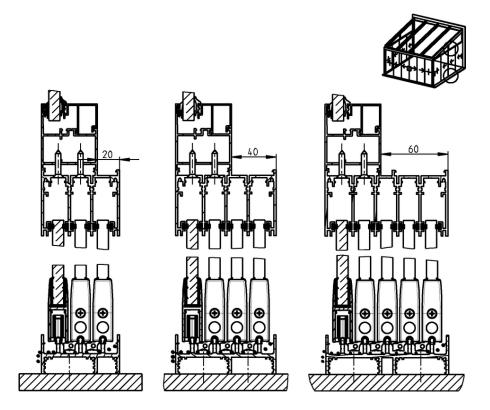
Assembly of the 3- to 5-track guide profiles below the roof support
